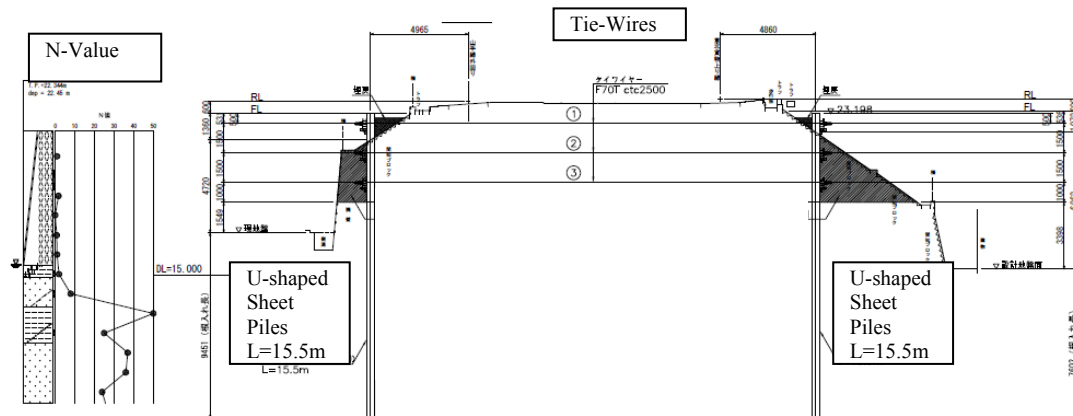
Typical Section of Otsuka-Sugamo Section of Embankment Upgrade
